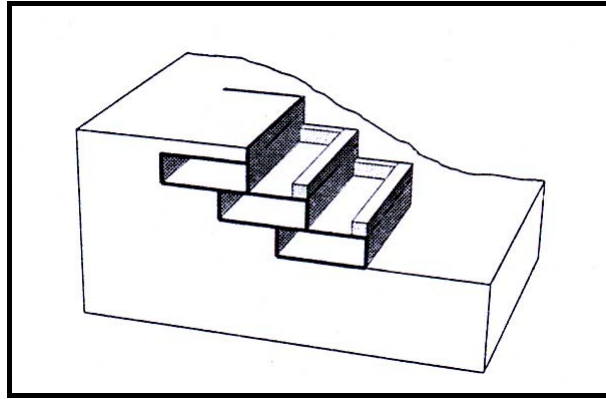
Terraced or Hillside Structure (Source: Sterling, 1993).
